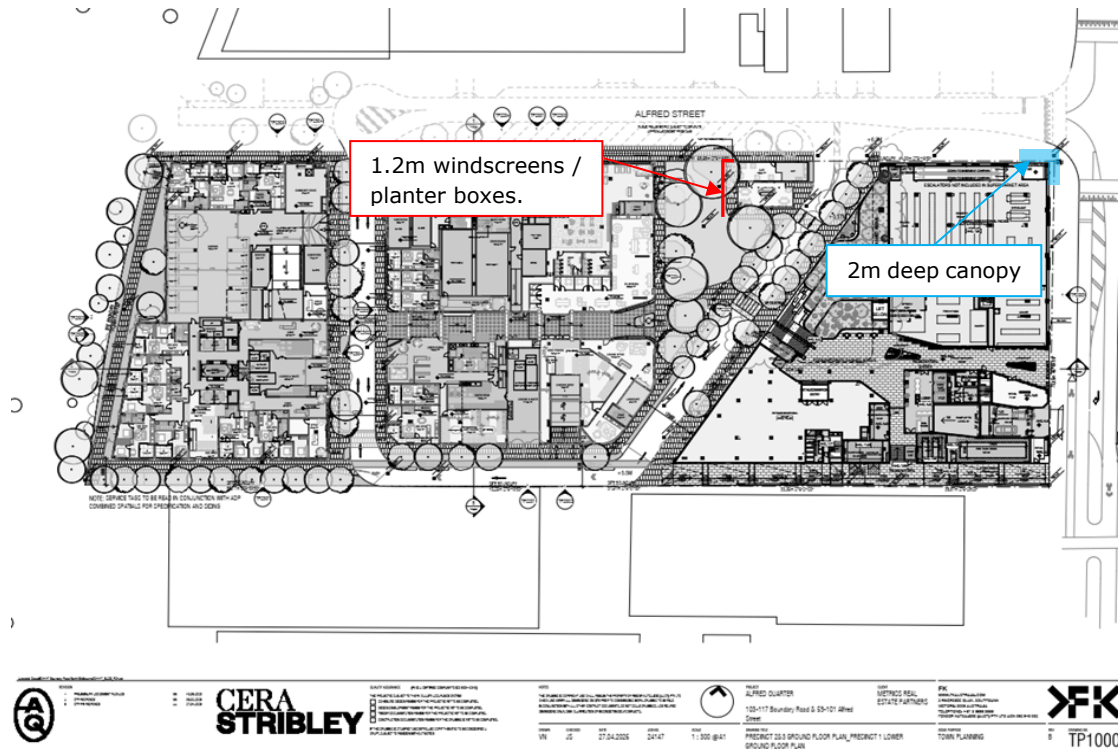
Ground floor plans with the recommended wind control measures overlaid.
